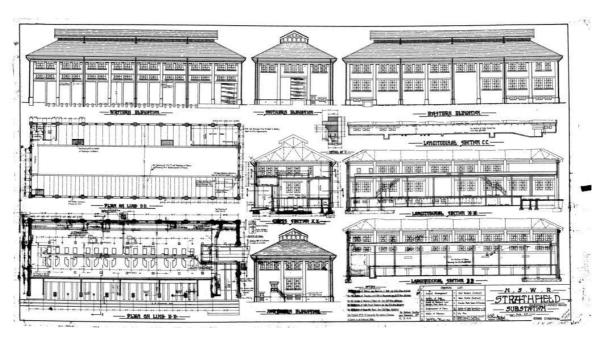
1927 plan and elevation of the Strathfield Sub-station showing the characteristic form and layout (RailCorp Plan Room, Ref: CV0079926).
